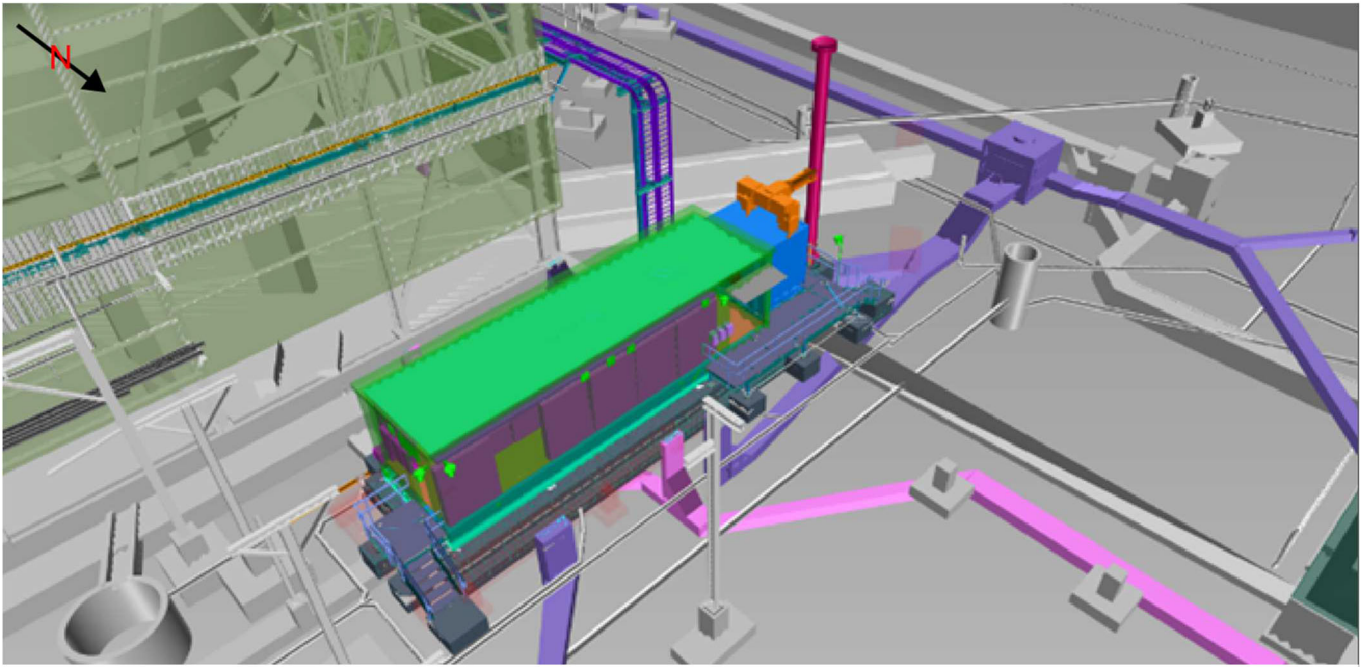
RIE Building - Model View W/ Power Duct Bank (Pink), Instrumentation Duct Bank (Purple), & Cable Tray (Purple)
